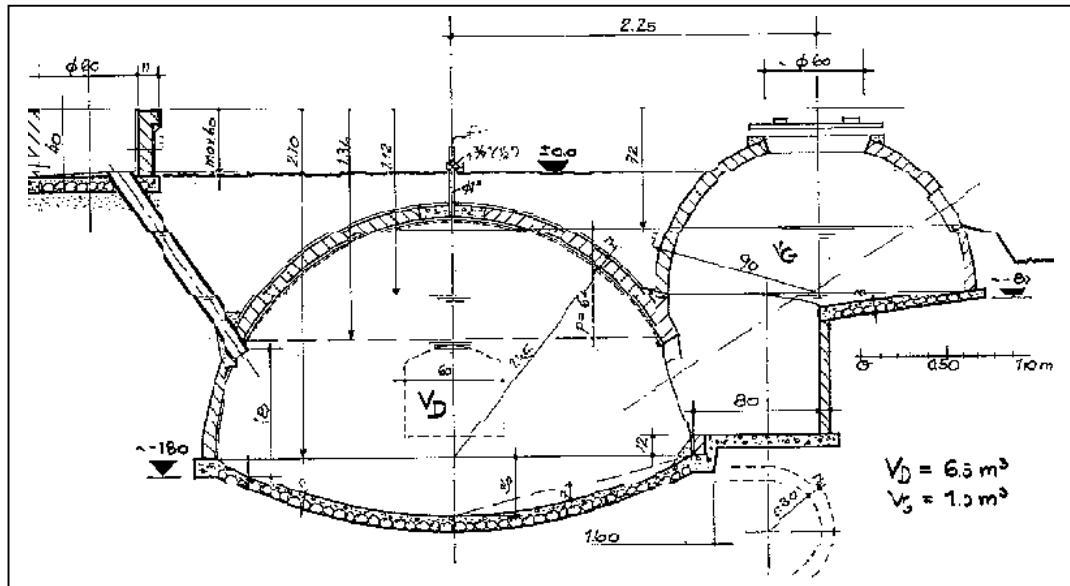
Constructional drawing of a fixed-dome plant without upper opening
